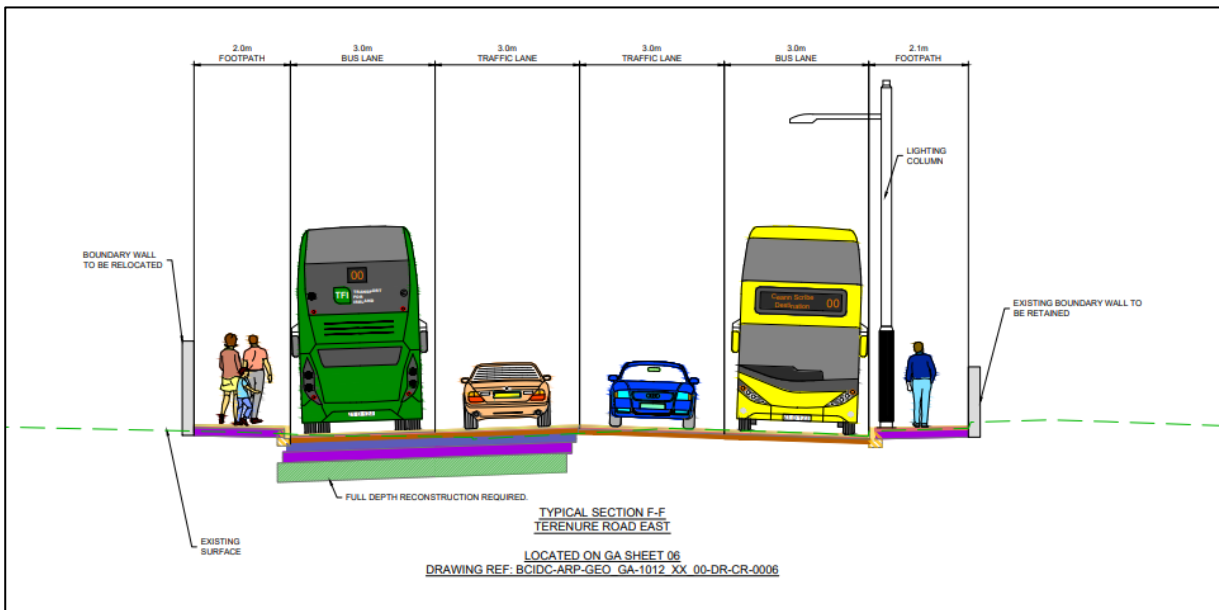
Typical Cross-Section adjacent to 4 The Townhouses Terenure Road East
